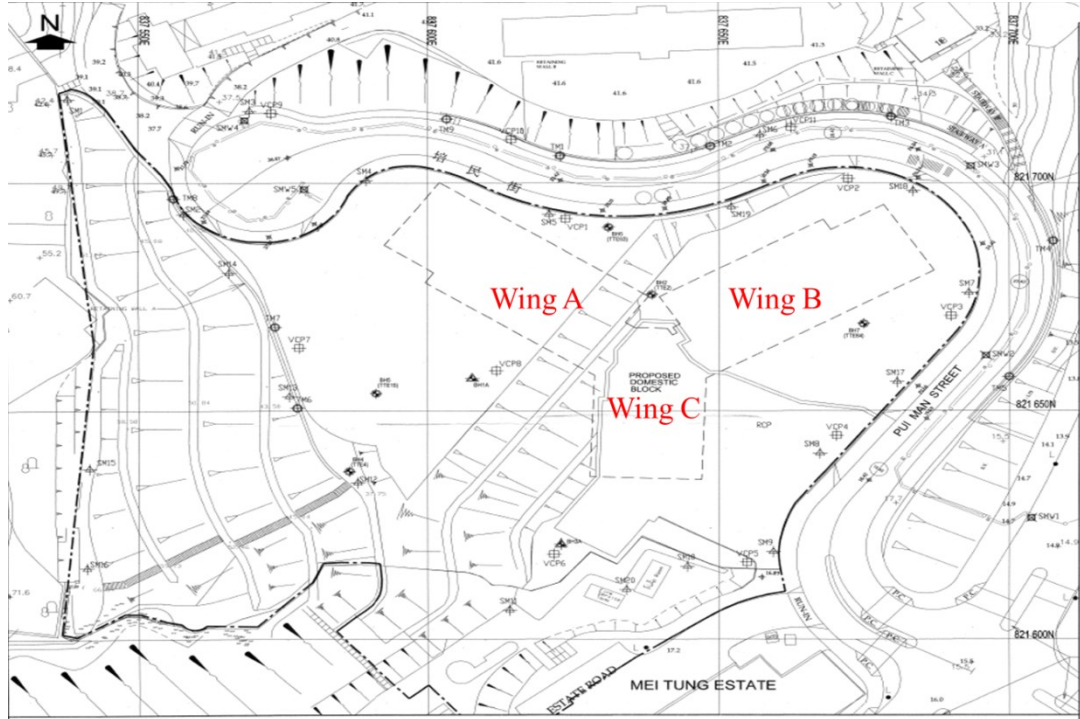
The general outline of Tung Tau Cottage Area East construction site
